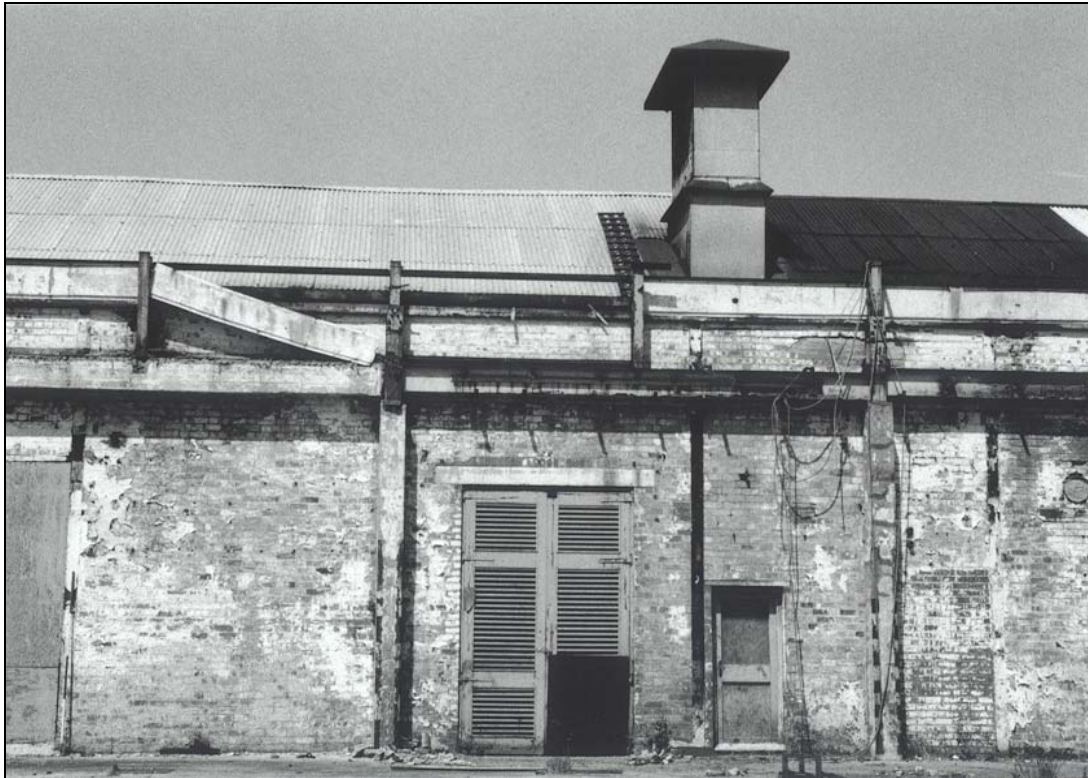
South elevation of engine room, formerly internal elevation within foundry.
